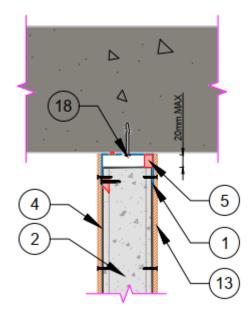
Dual wall system with vertical wall between horizontal walls – vertical head detail – option 02
